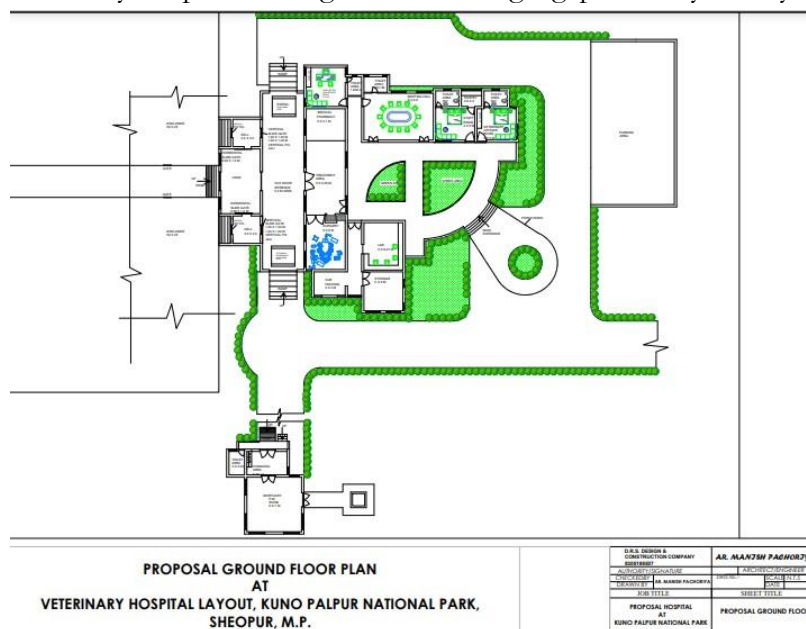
Proposed ground floor plan of Veterinary hospital at Kuno National Park
